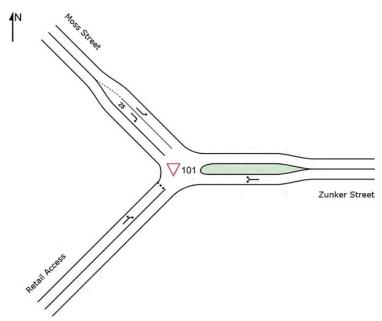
Moss Street / Zunker Street / Retail Access - SIDRA layout
